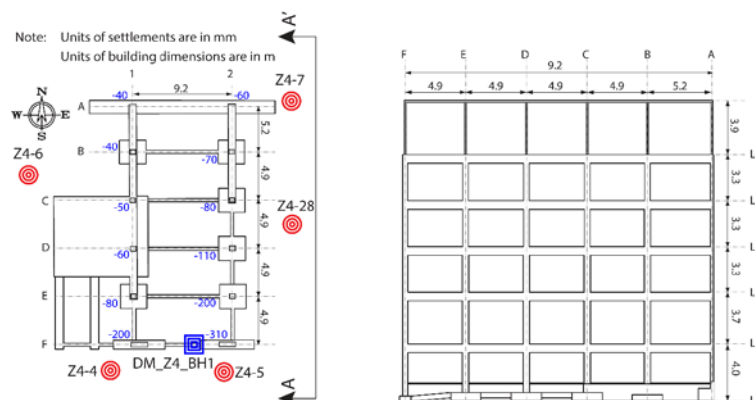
Foundation plan view of the CTUC building and elevation view of its eastern NS-oriented frame.
